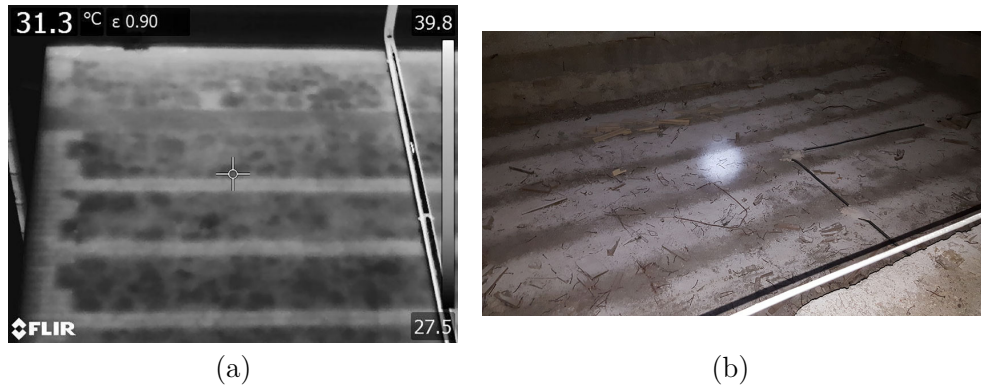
(a) Infra-red image highlighting the masonry typology, simple stone with brick courses. (b) Detail of the floor diaphragm at the top of the second level, showing the presence of iron beams drowned in the concrete slab.
